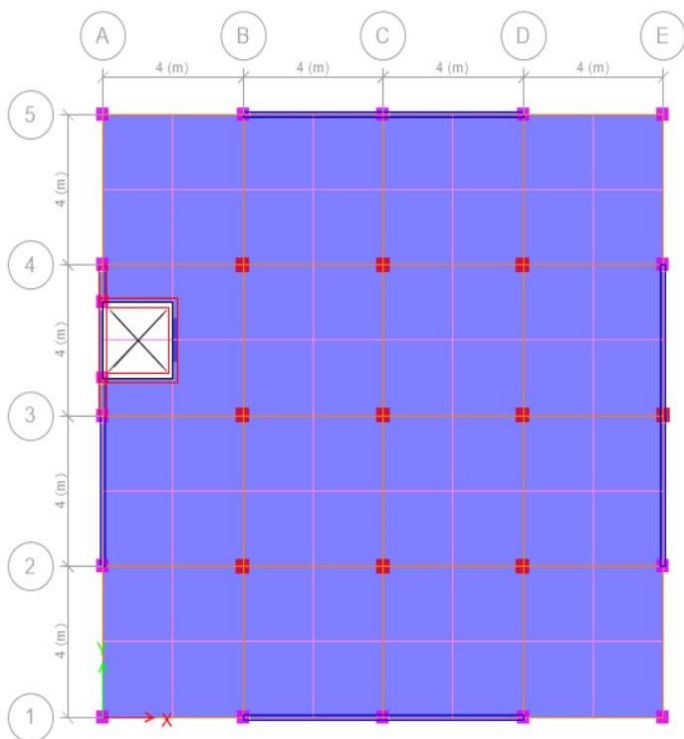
Plan view of RC frame structure with shear wall at mid of the outer periphery of structure
